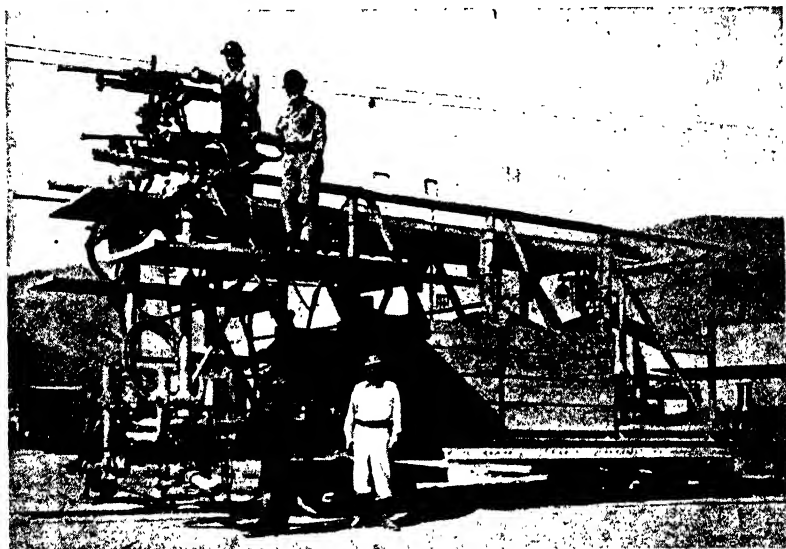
One type of drill carriage used on the Colorado River Aqueduct tunnels, mounting six drifter drills. (Courtesy of Worthington Pump & Machinery Corp.)
